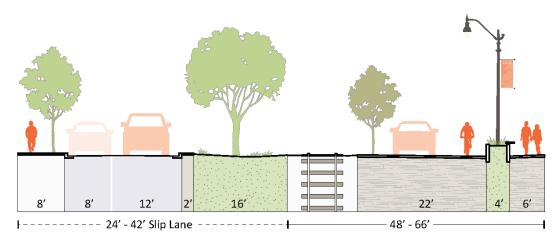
B (1). Hydraulic Street (Long-term).
